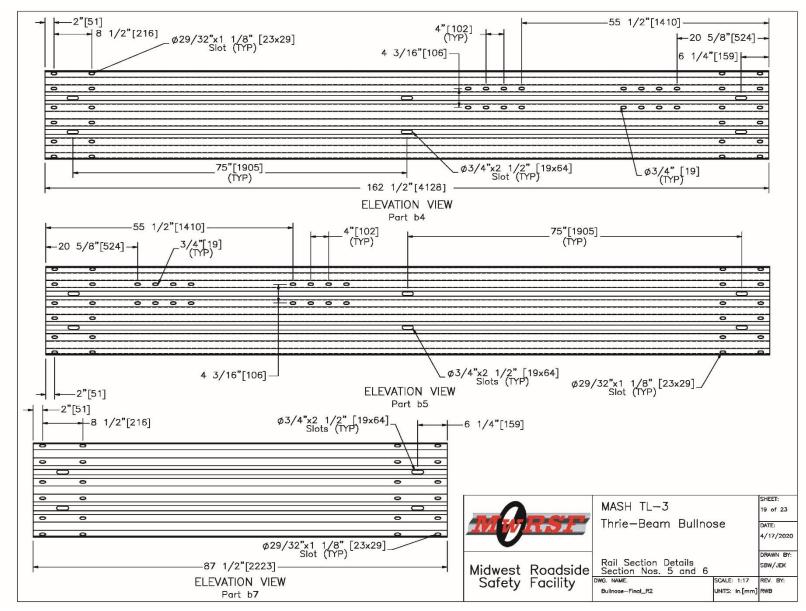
Rail Section Details, Section Nos. 5 and 6, Bullnose Final
